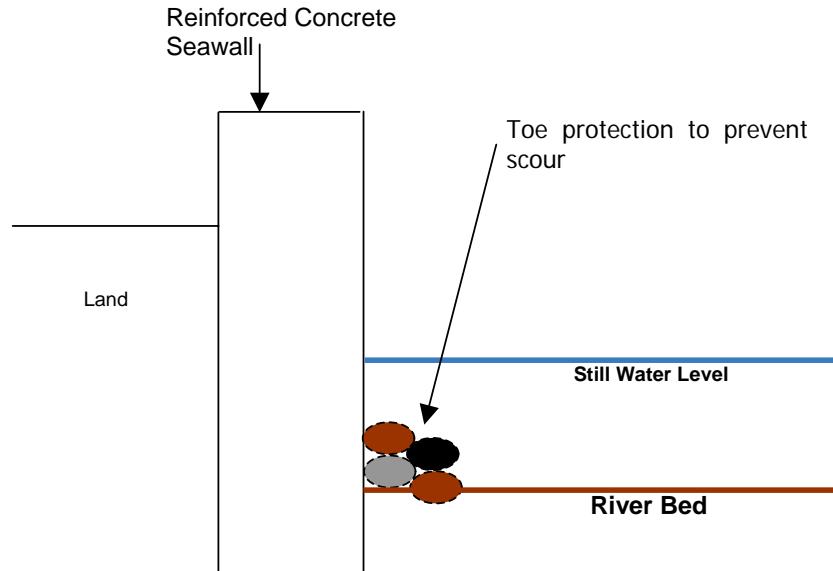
TYPICAL CROSS SECTION OF QUAY WALL
